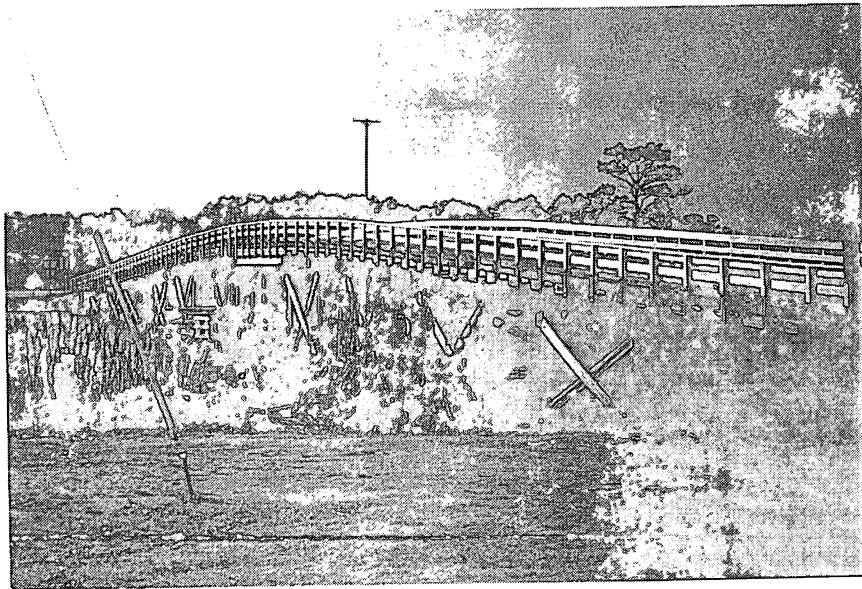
Bridge No. 49 (Outside Stella Historic District), Looking West.
